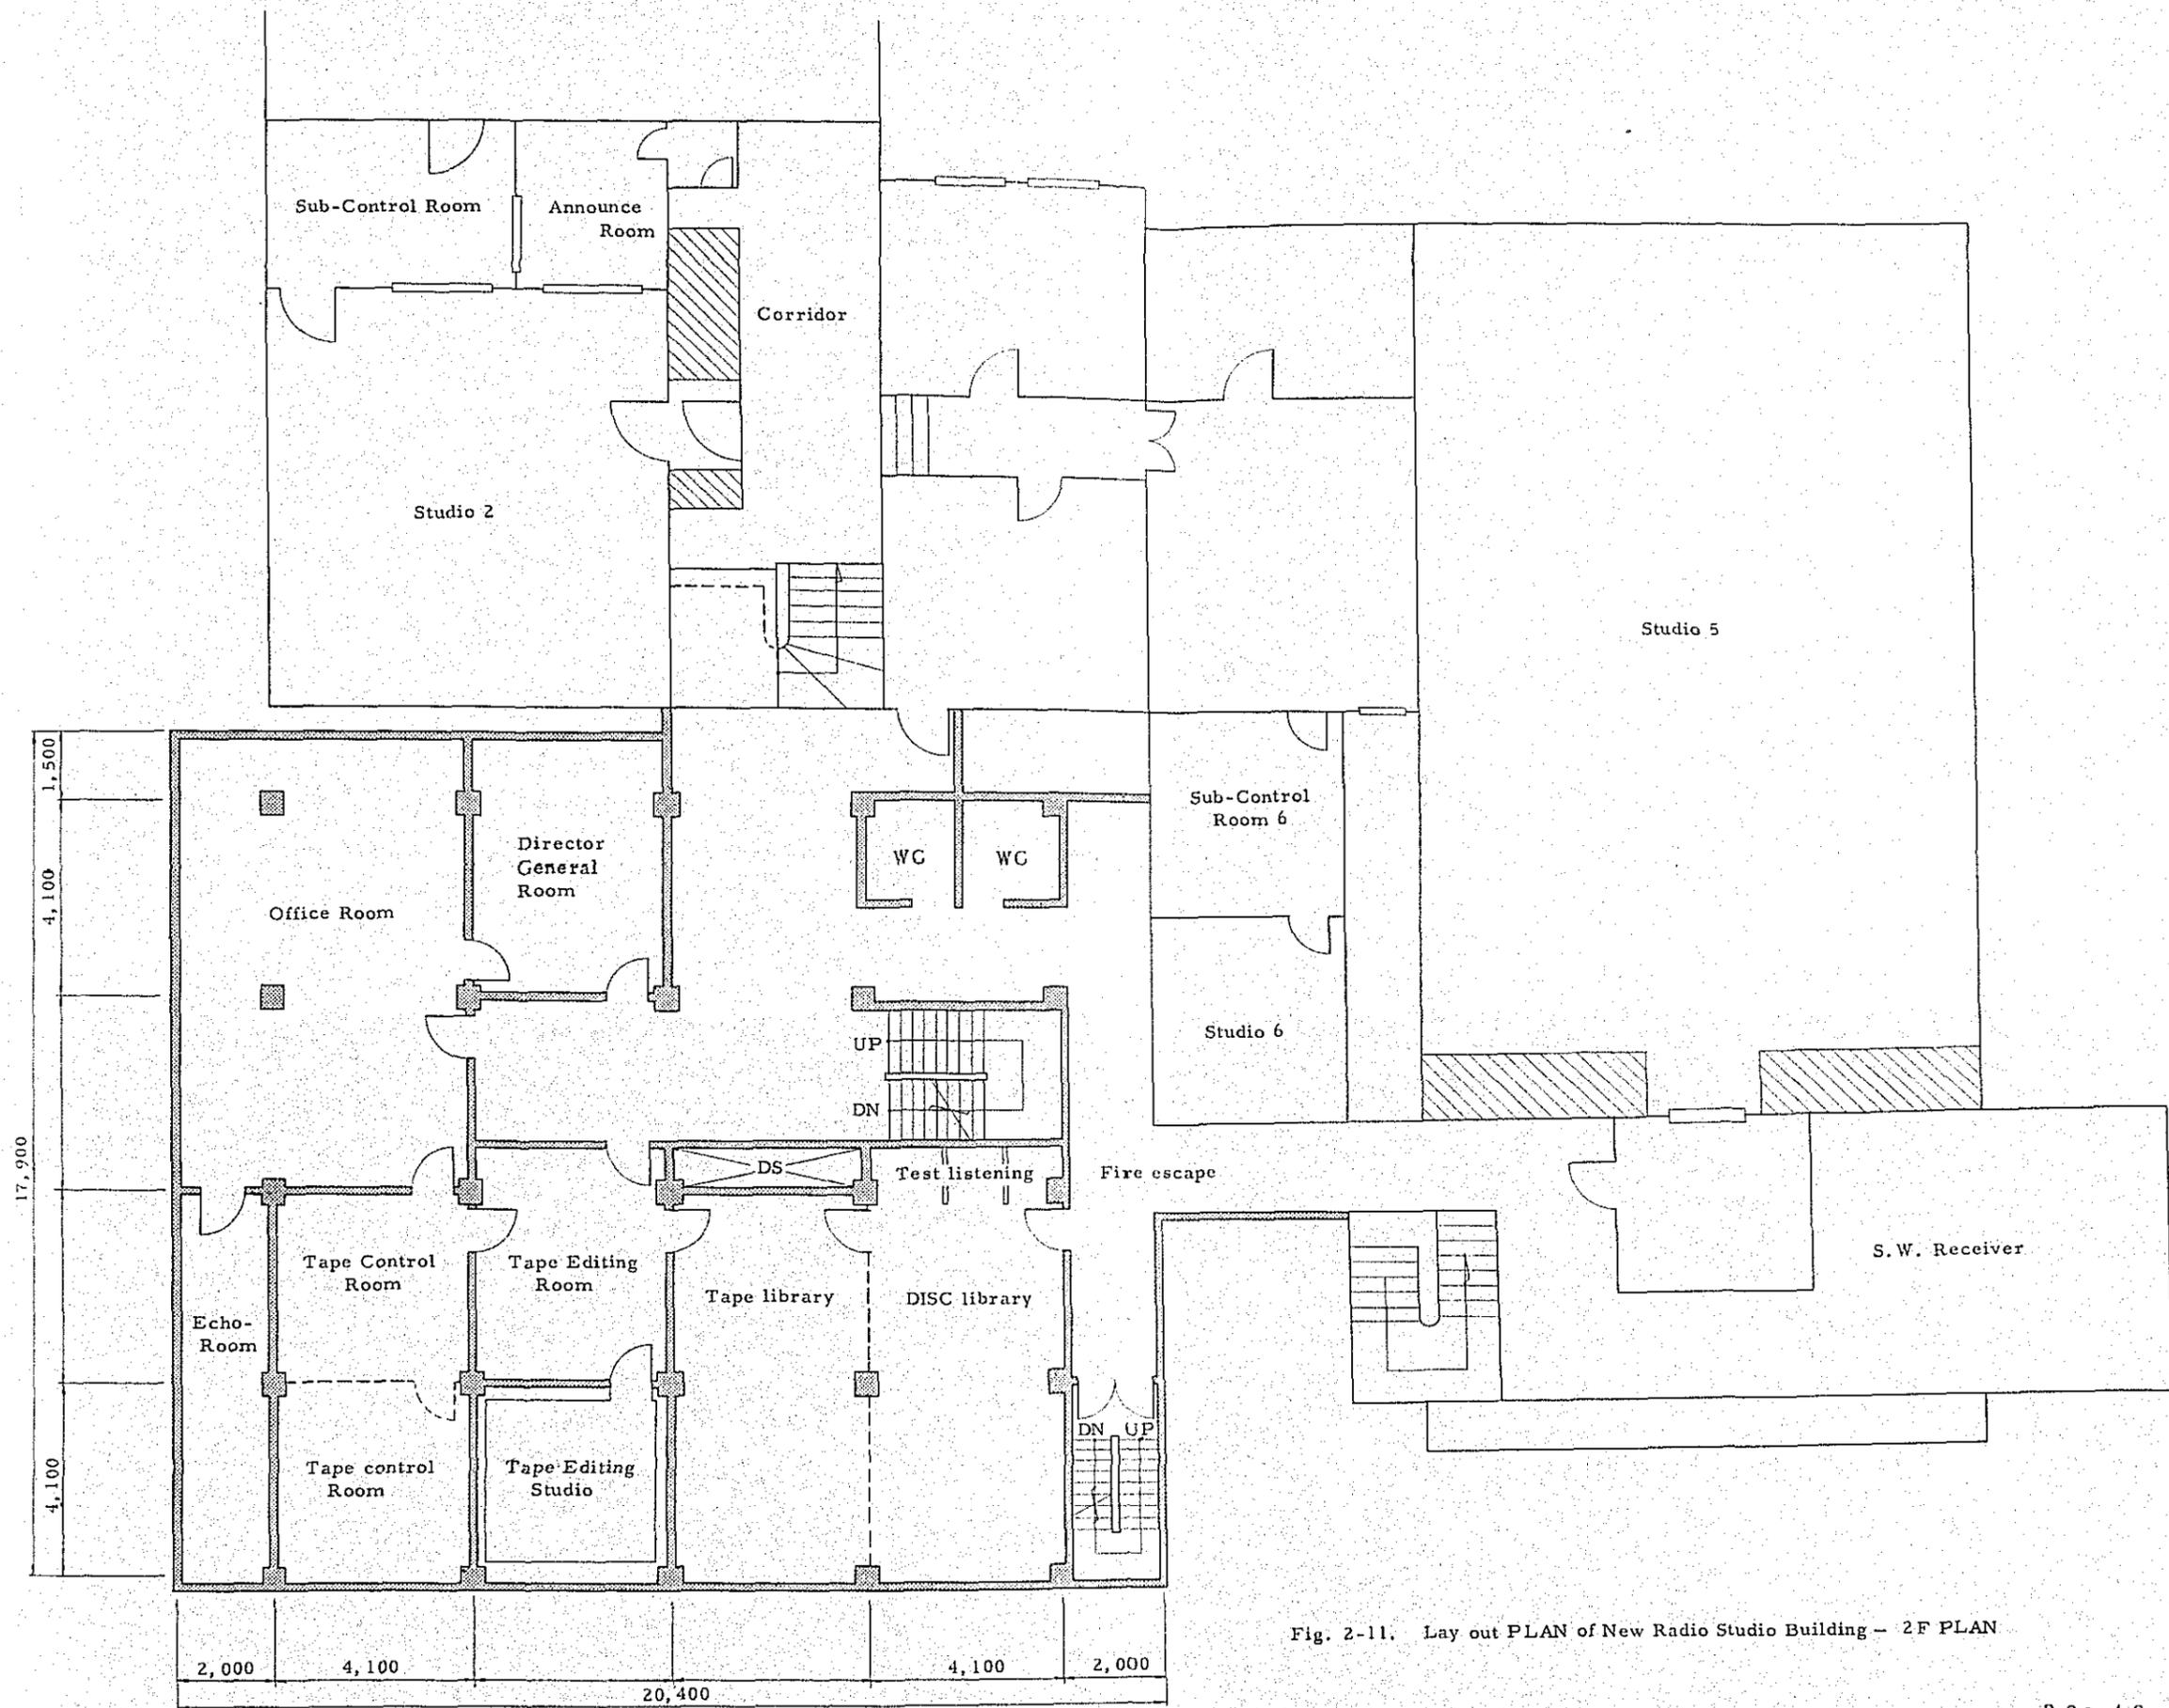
Lay out PLAN of New Radio Studio Building - 2F PLAN
